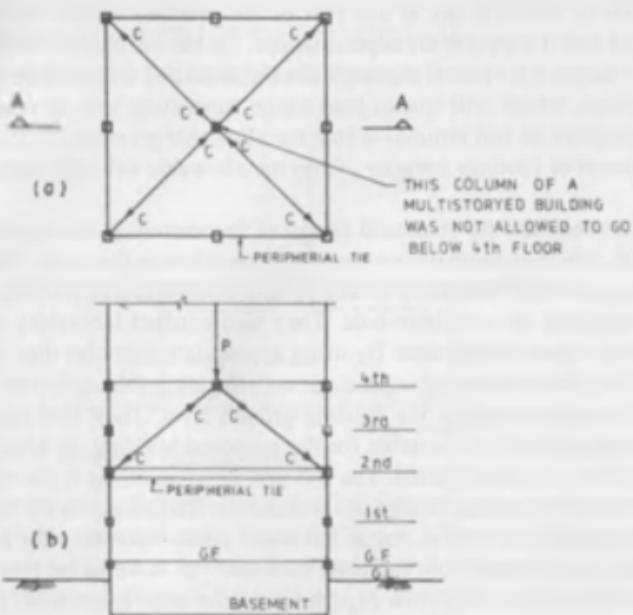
Scheme for supporting a column of multistorey building above ground floor level. (a) Plan; (b) Section A-A.
